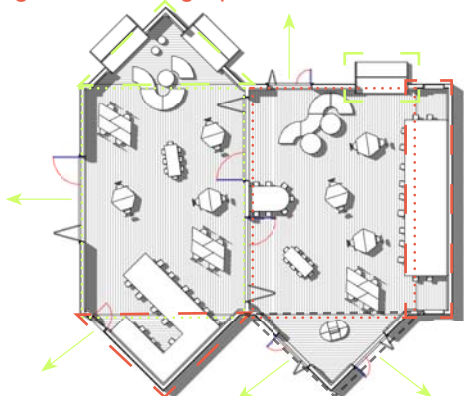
Examples of possible Flexi-Ed floor plan configurations
